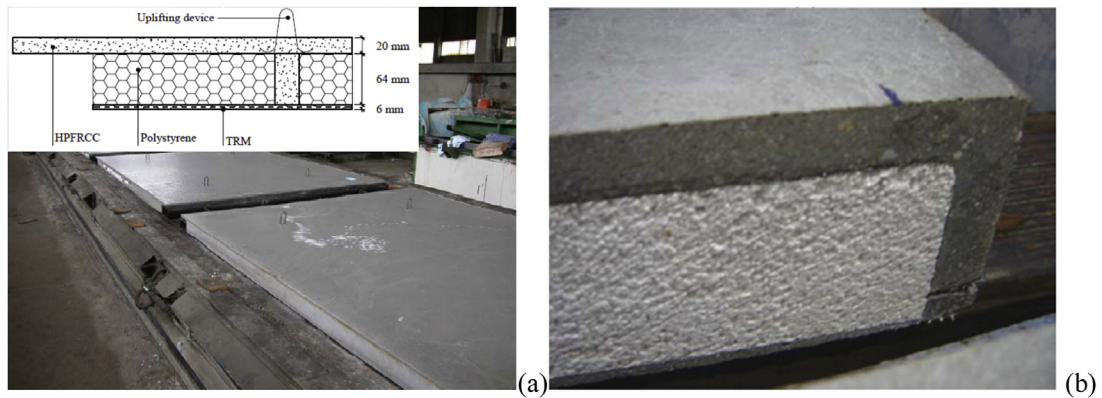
Layered HPFRCC/TRC elements on the precast runway (a) and detail (b) [59].
